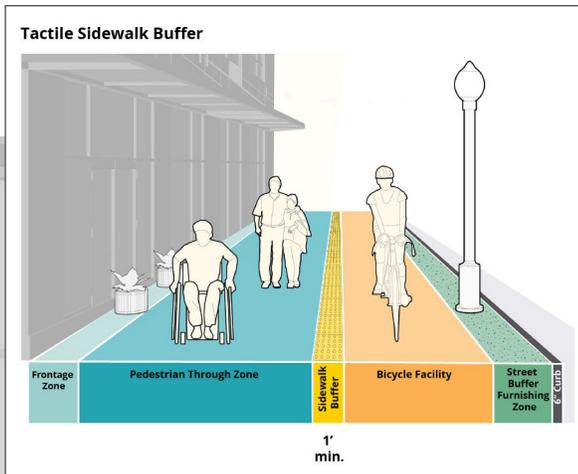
Sidewalk level bicycle facility on SW Bond Ave
